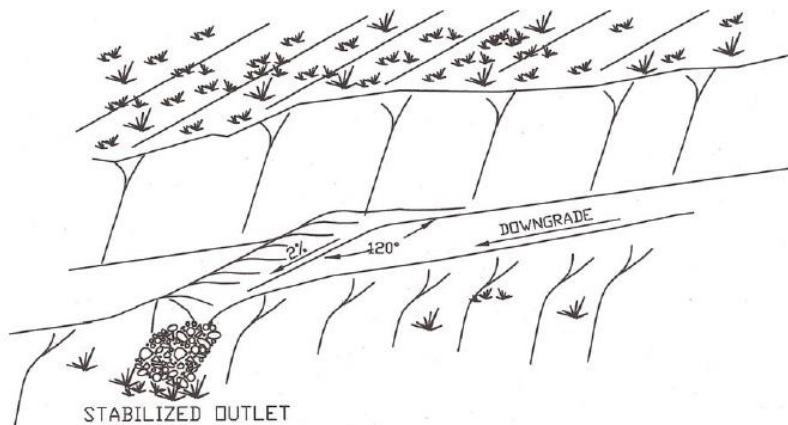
Water Bar on vineyard road. Small gently sloped channels across the road divert runoff to the side of the road to prevent erosive forces from water flows along the road. Water bars should be stabilized with gravel at the outlet.
